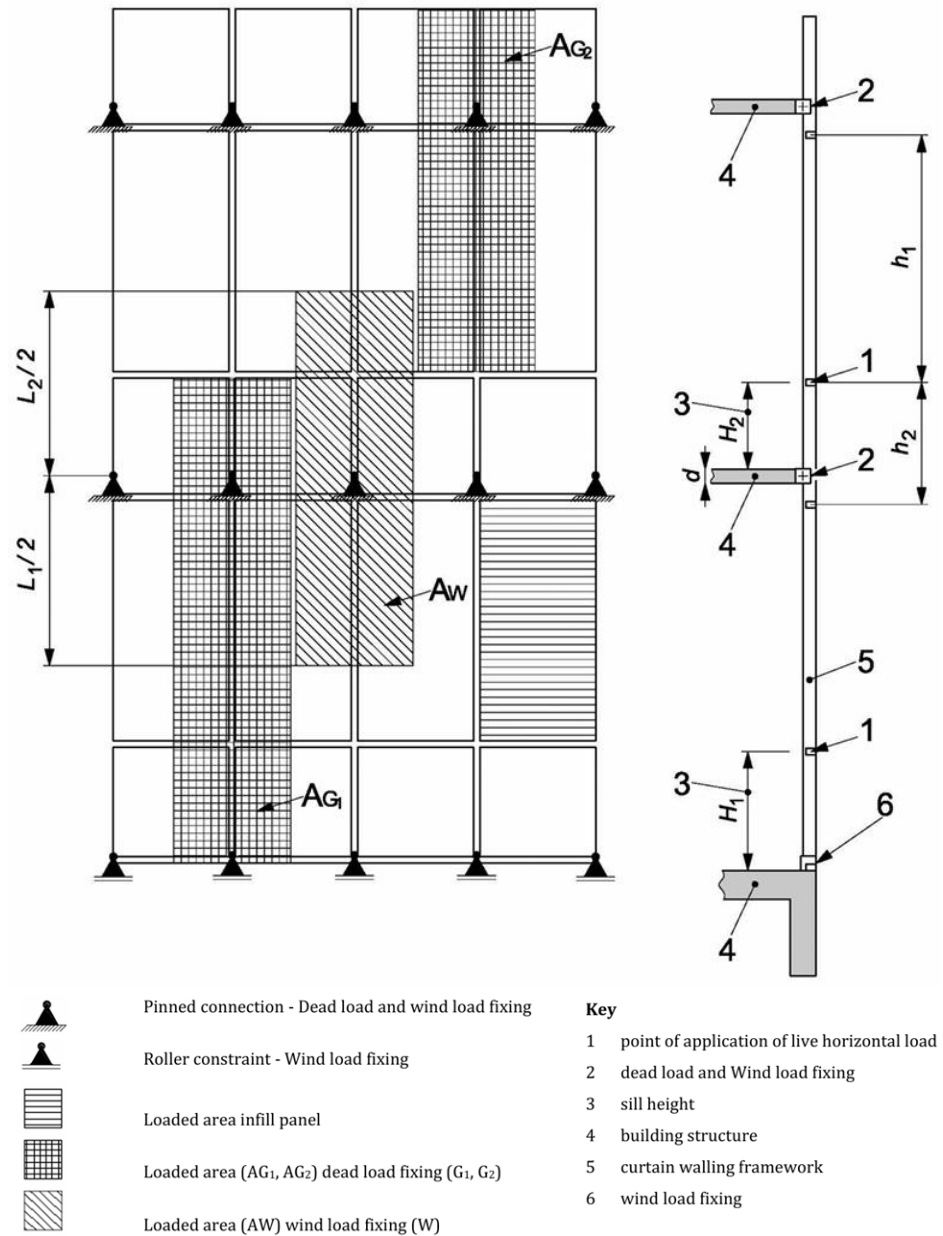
1: Curtain wall typical fixing and loaded area (source: UNI EN 13830:2020 A.1)
